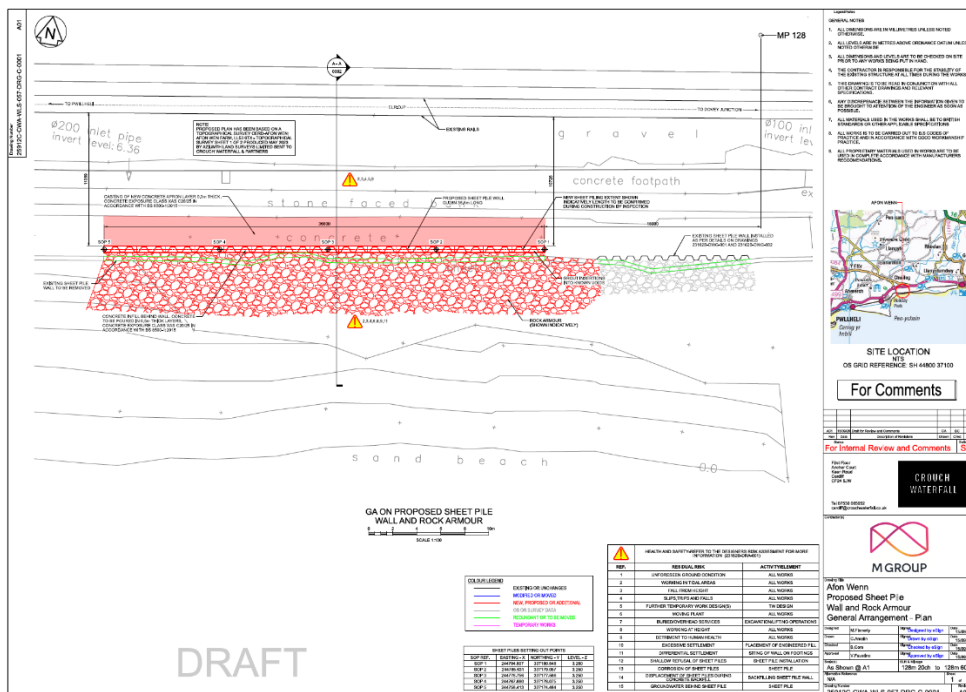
Drawing illustrating new rock armour extent (red) near northern rail crossing.
